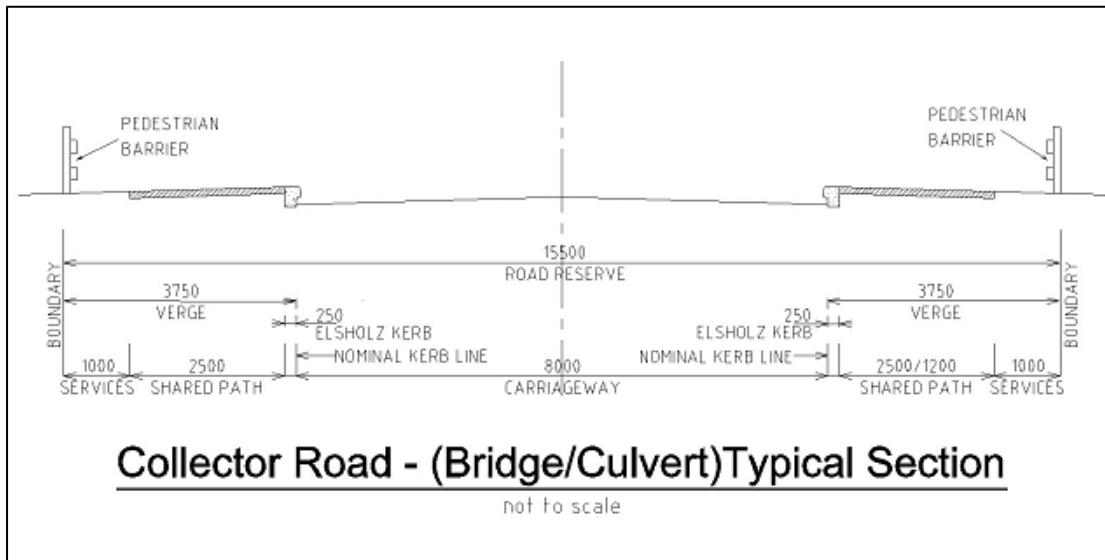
Manooka Valley Collector Road (Bridge/Culvert) Typical Section
